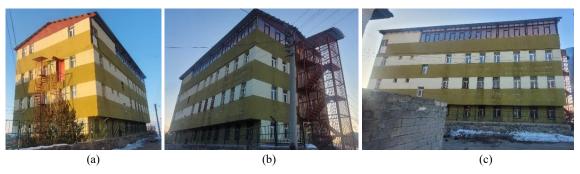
Various views of the examined educational building: (a) southeast facade; (b) northeast facade; (c) east façade
